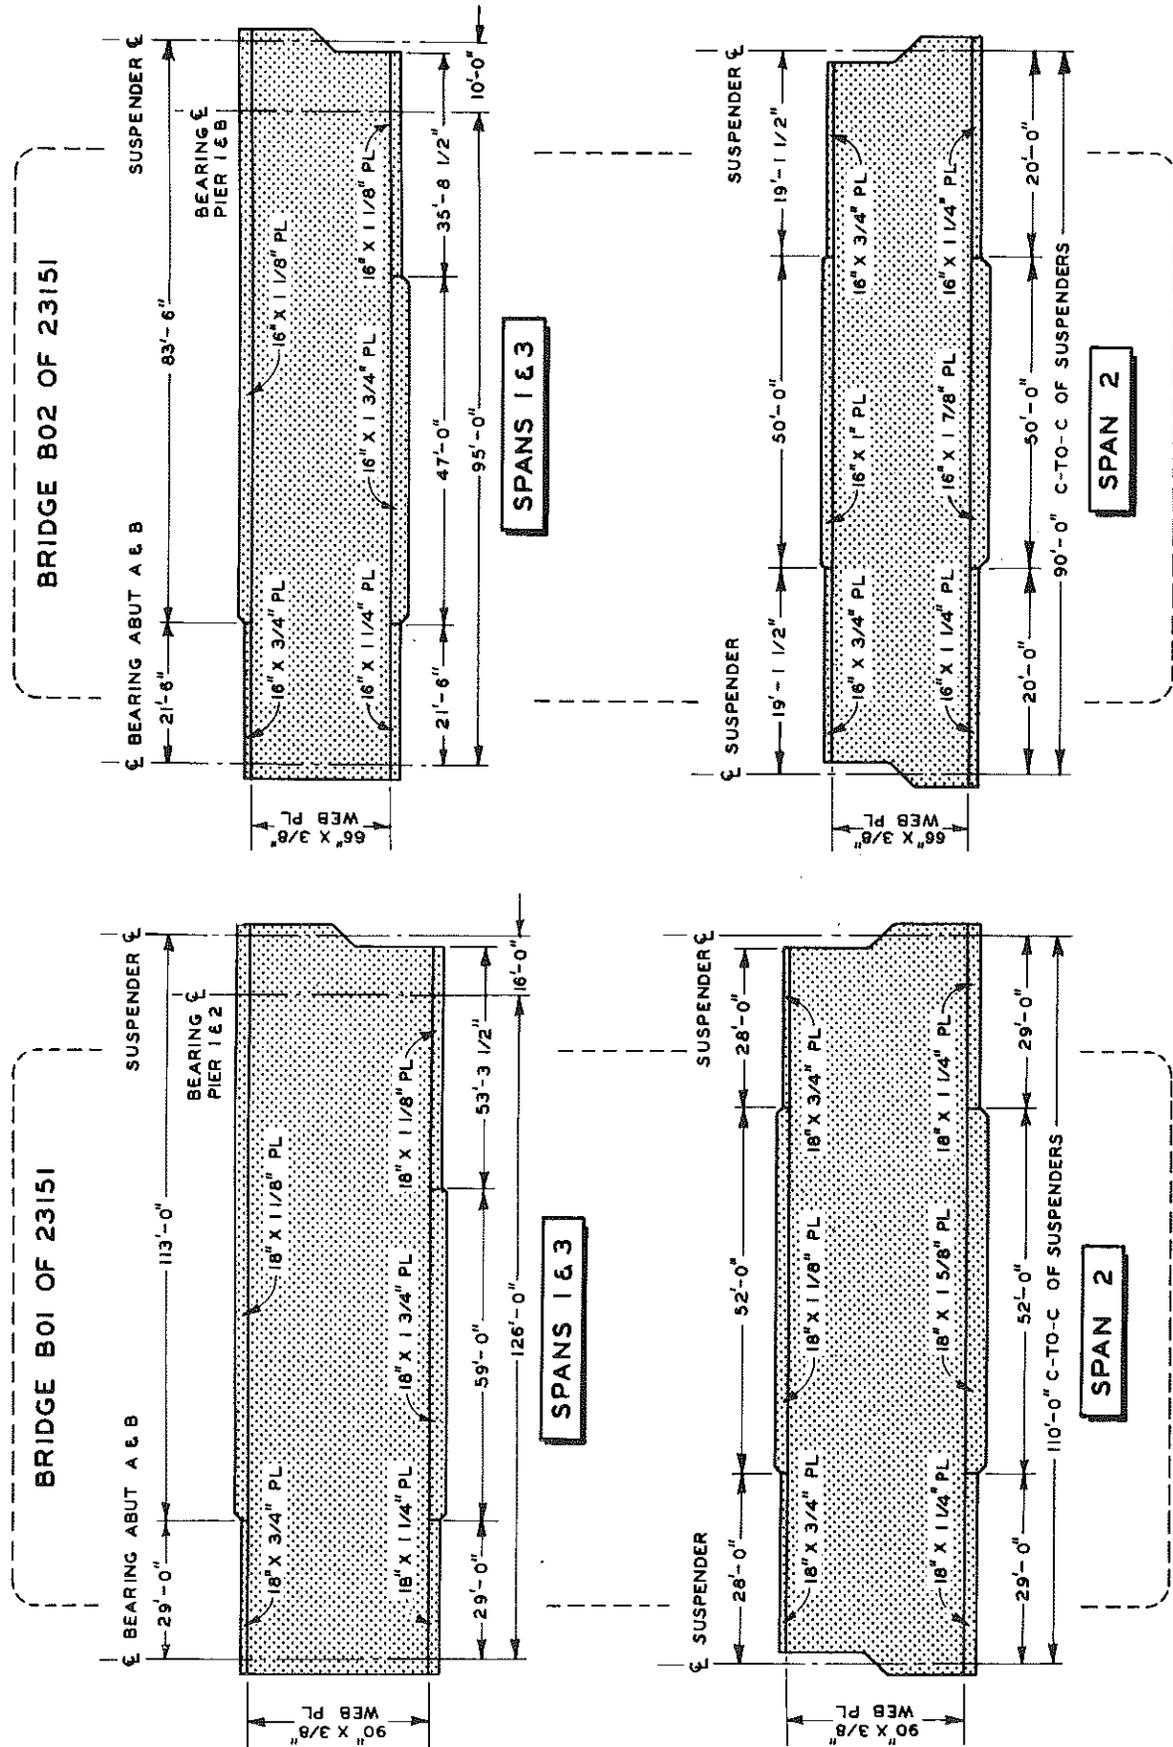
Typical plate girder elevations, showing change in flange plate thickness.
